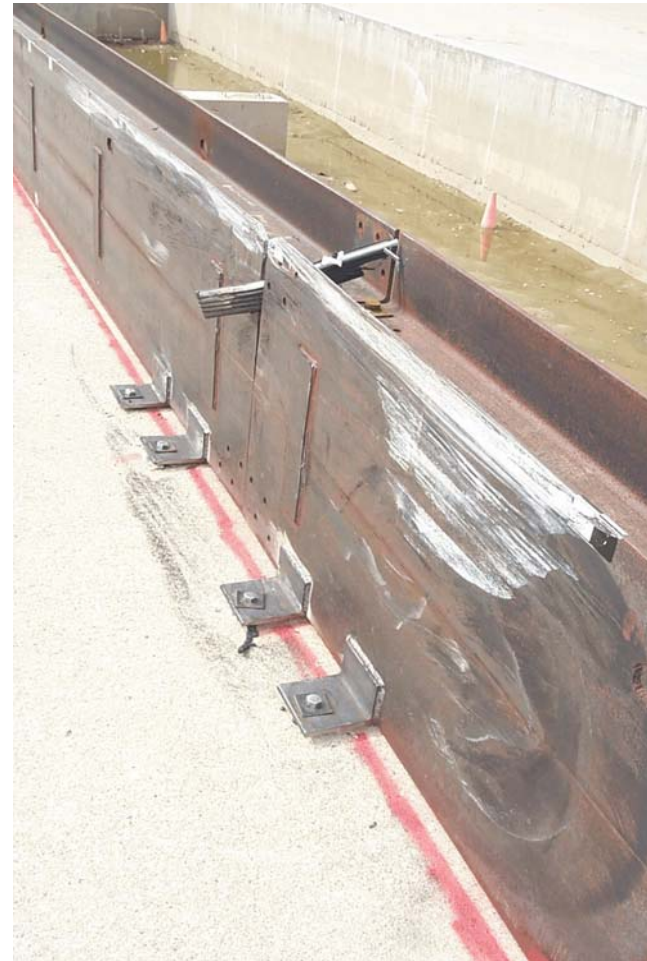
Steel H-section Barrier System Damage, Test HTB-1
